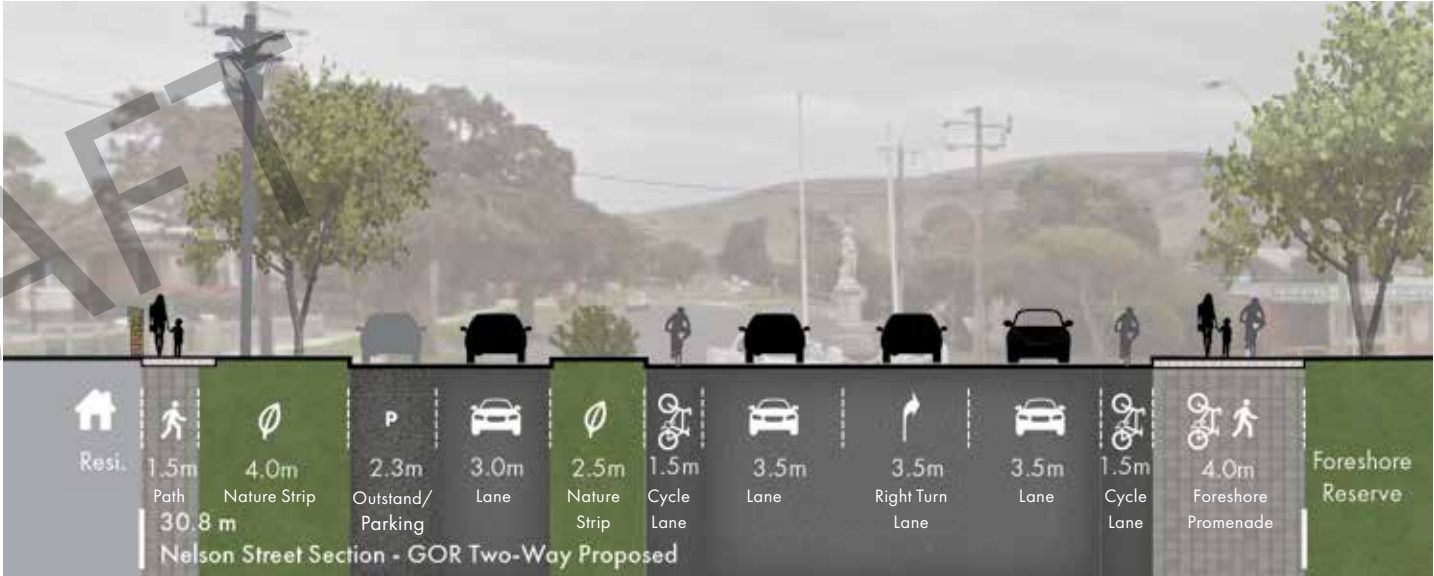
Great Ocean Road (Nelson Street to Nelson Street) A-A' Two-Way - Proposed
